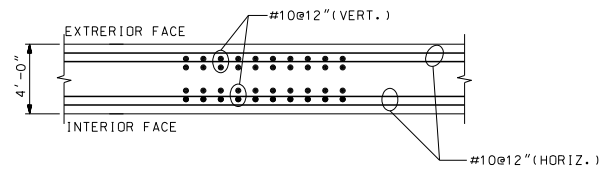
A-44 Reinforcement Arrangement of the AB MCR Wall (Section 2)
